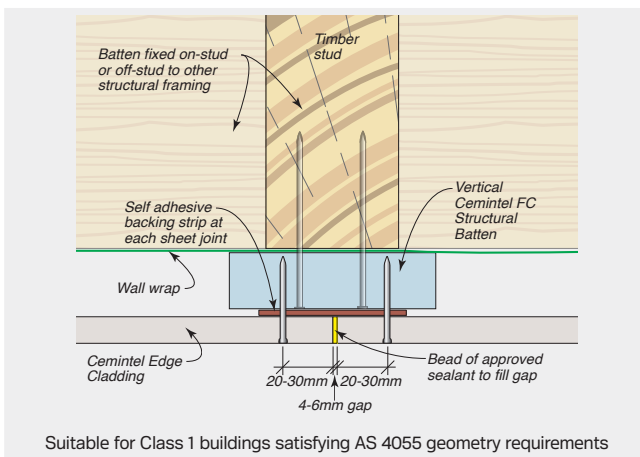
Typical Cavity Fix Cladding to Timber Stud – Vertical Joint
